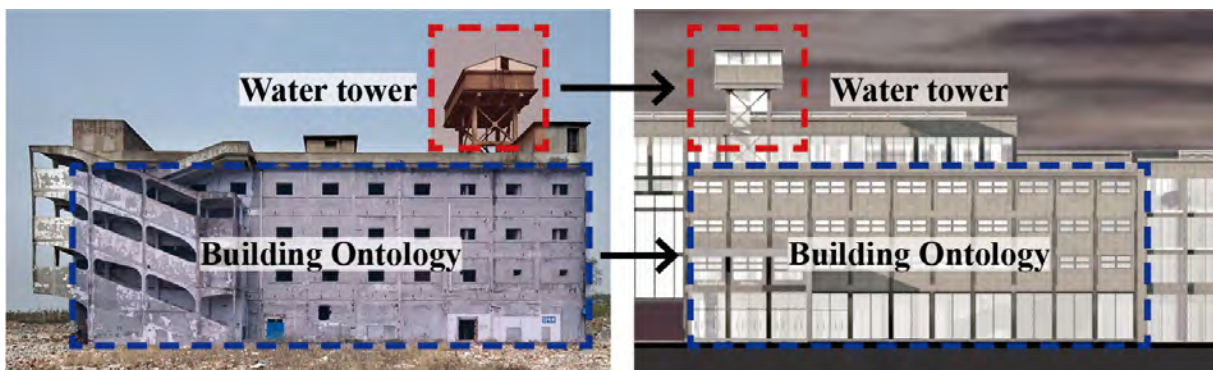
Fragment retention plan for Hutchison’s factory (Source: Zhou Qi studio design)
